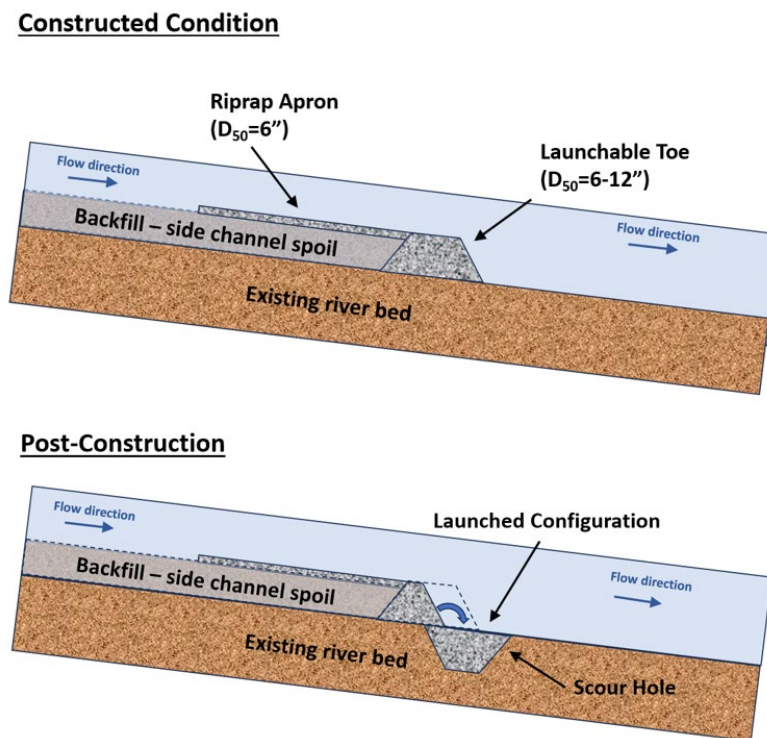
Schematic of a typical trenched bed control feature with upstream rock sill (not to scale) and showing both the constructed condition and the post-construction condition including the launch of the stone toe.
